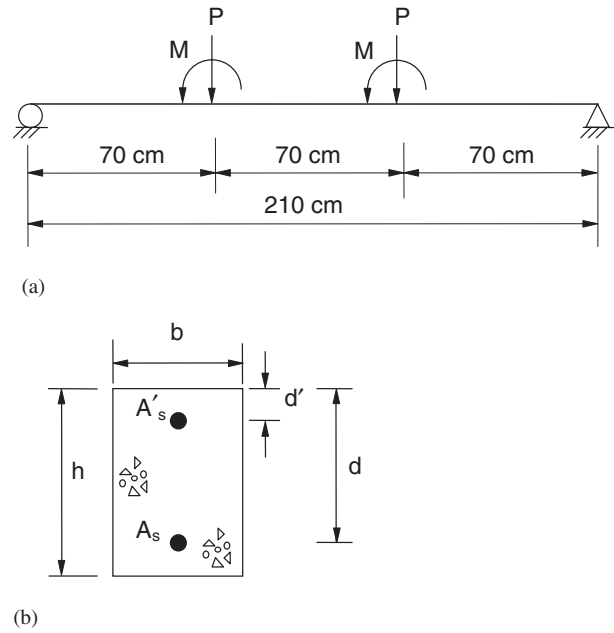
A simply supported RC beam. (a) Elevation and (b) cross section.
